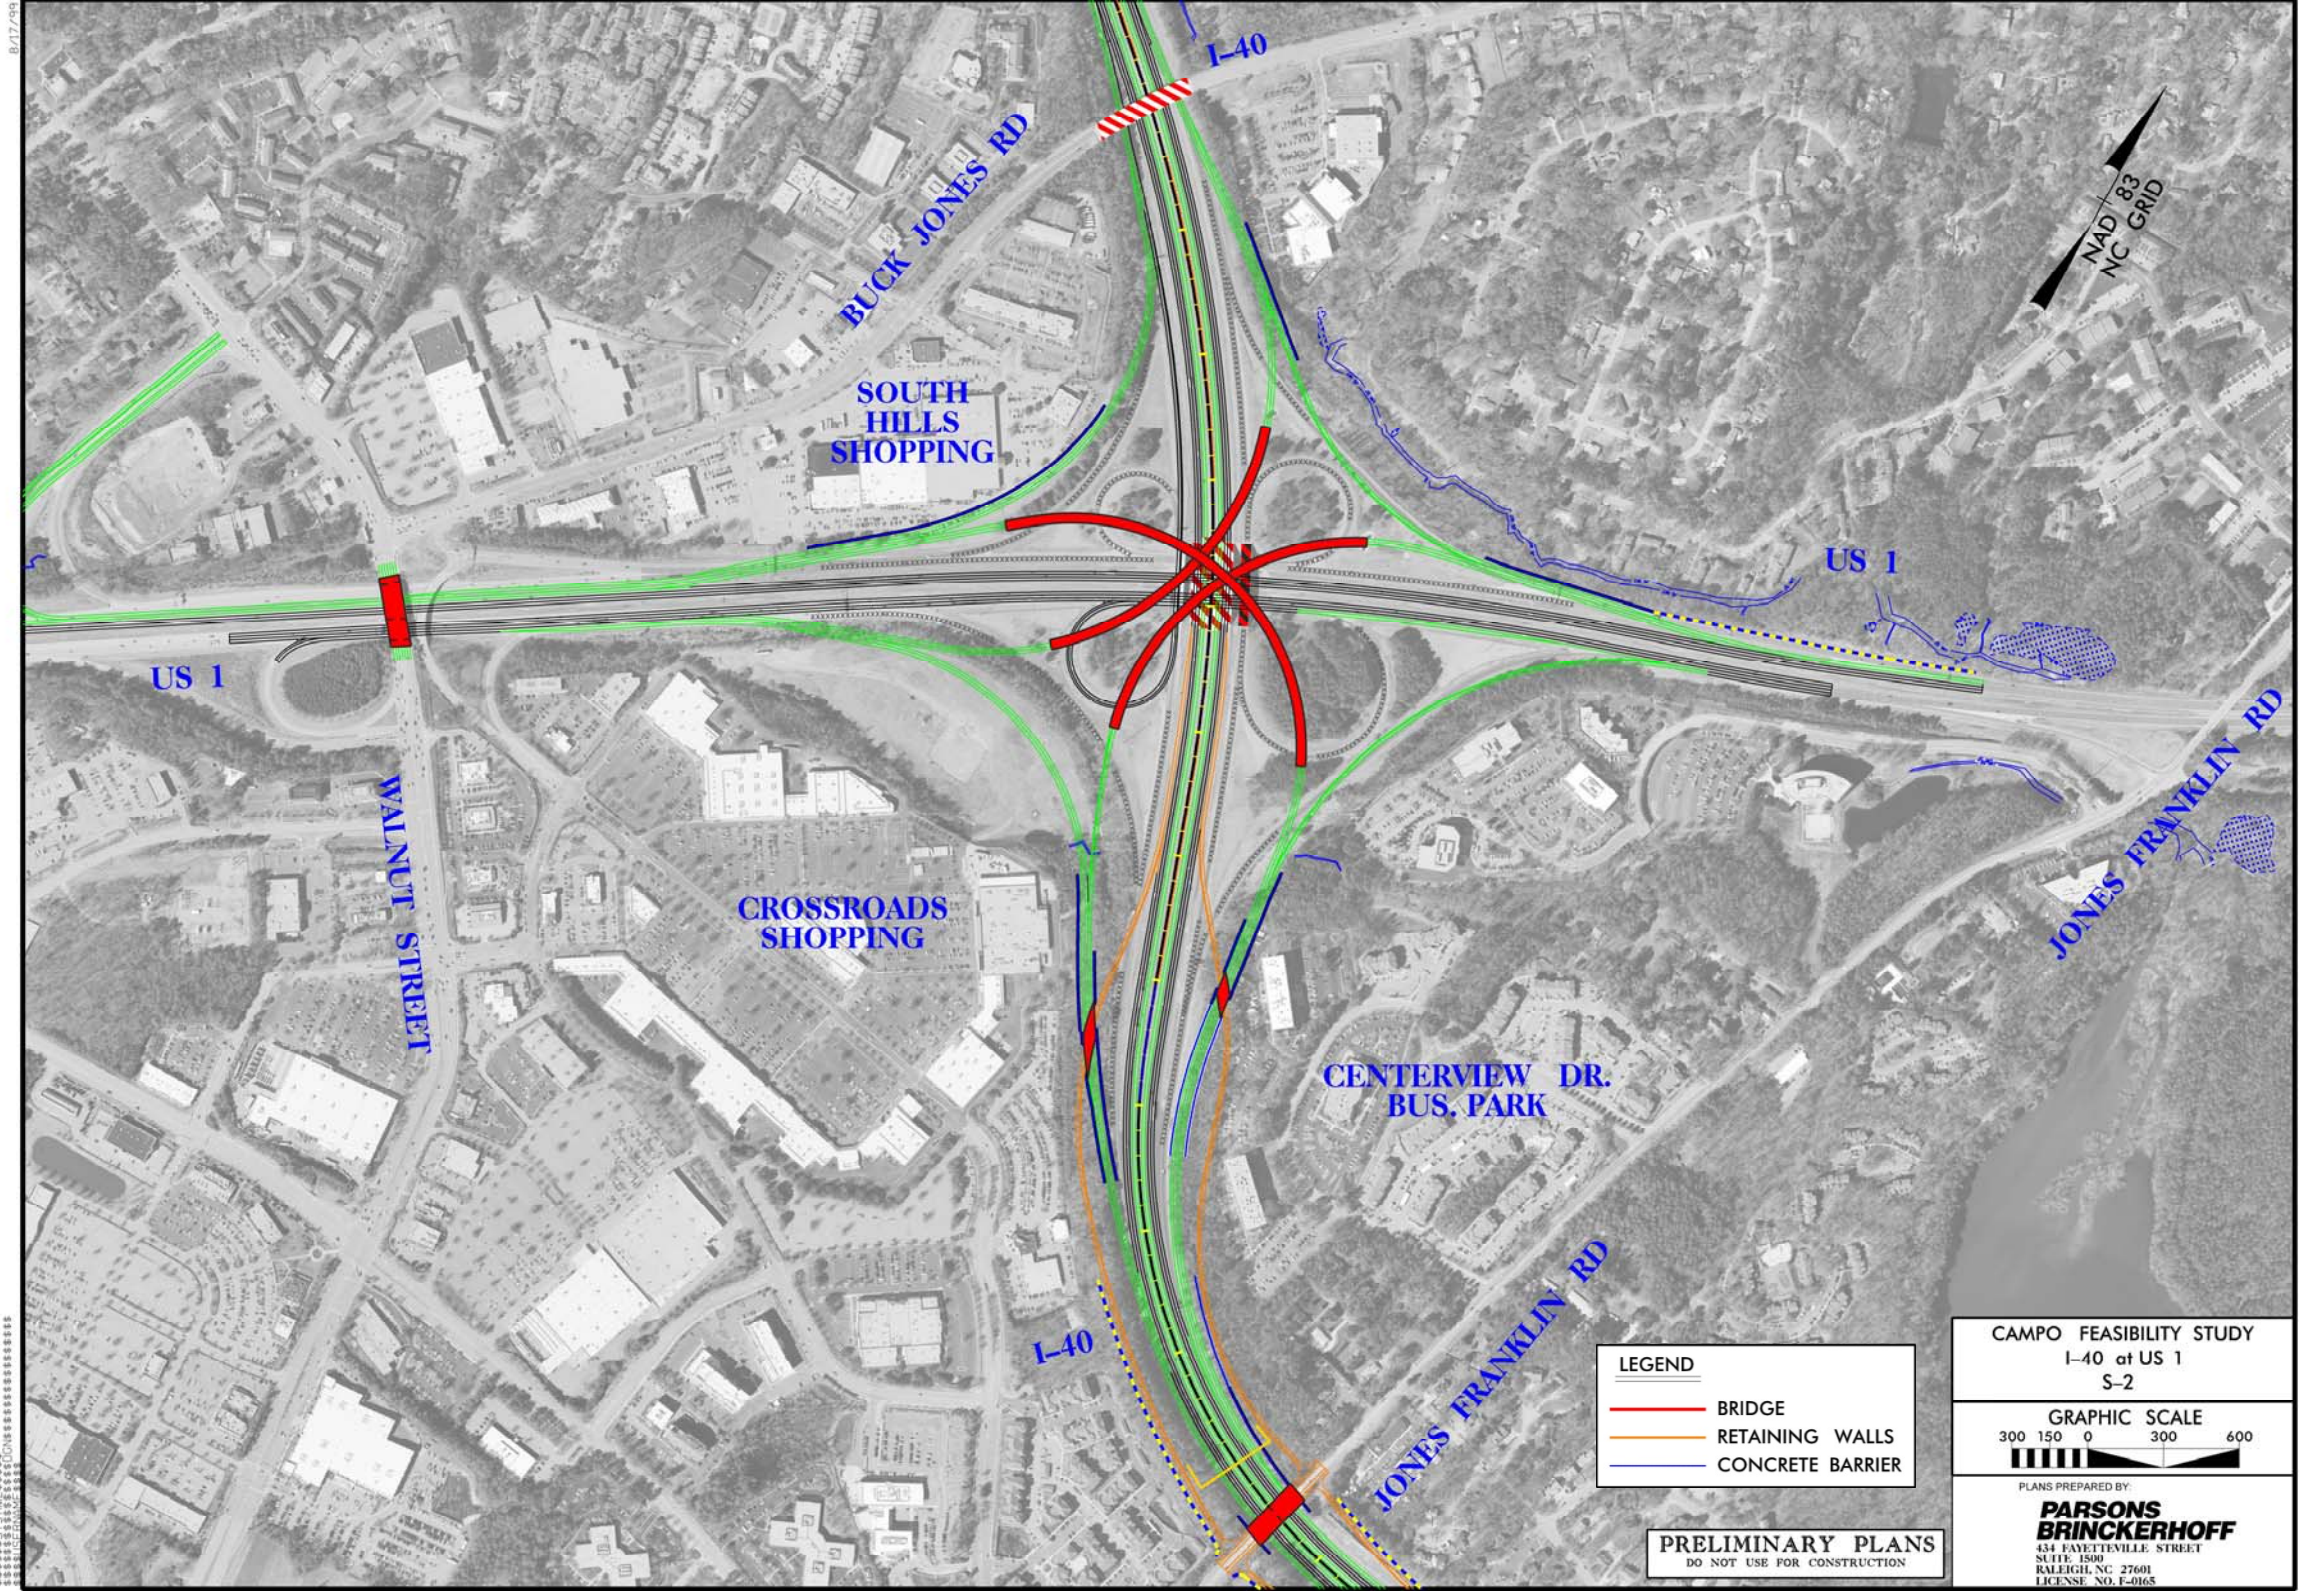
Alternative B-4 Modified Box with CD & 4 Loops for Crossroads Access
